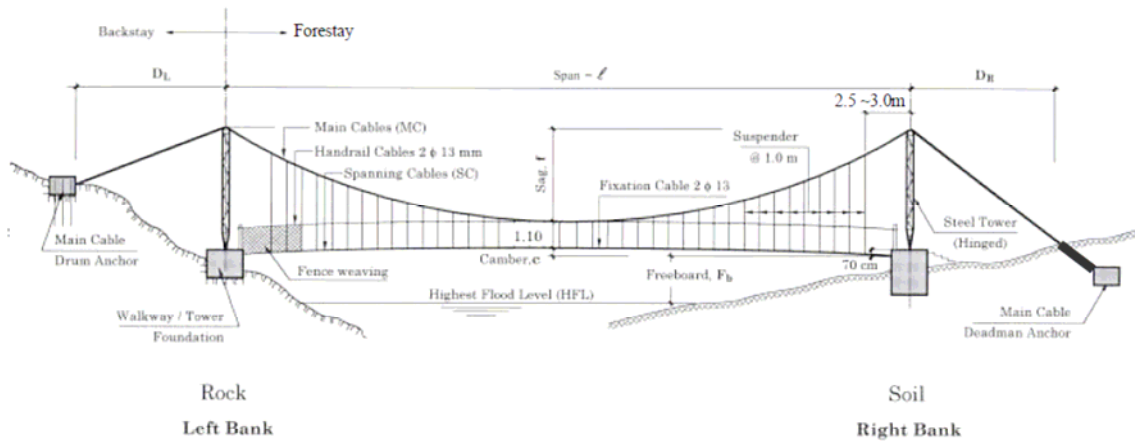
Typical profile for Helvetas pedestrian suspension bridge (Helvetas/TBSP 2003b)
